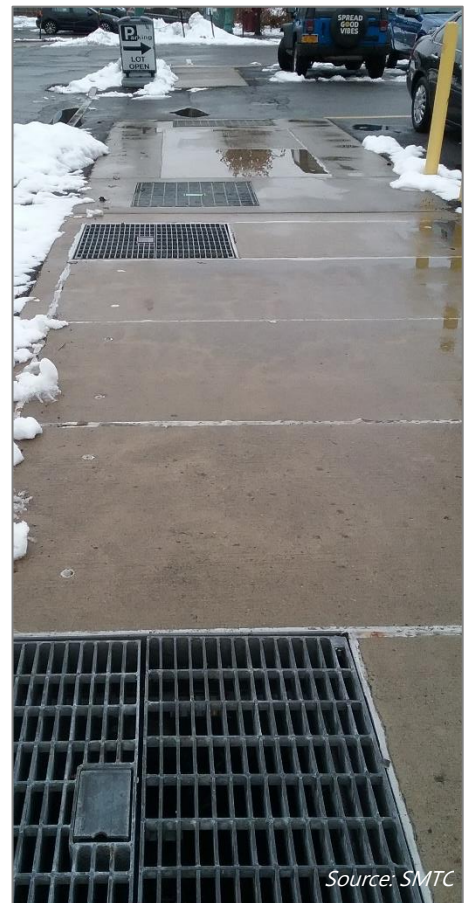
Existing sidewalk grates. Grates in the sidewalk on Walton Street's 200 Block are not ADA compliant; longitudinal grooves should be at right angles to the direction of travel & all gaps should be a half-inch or less
